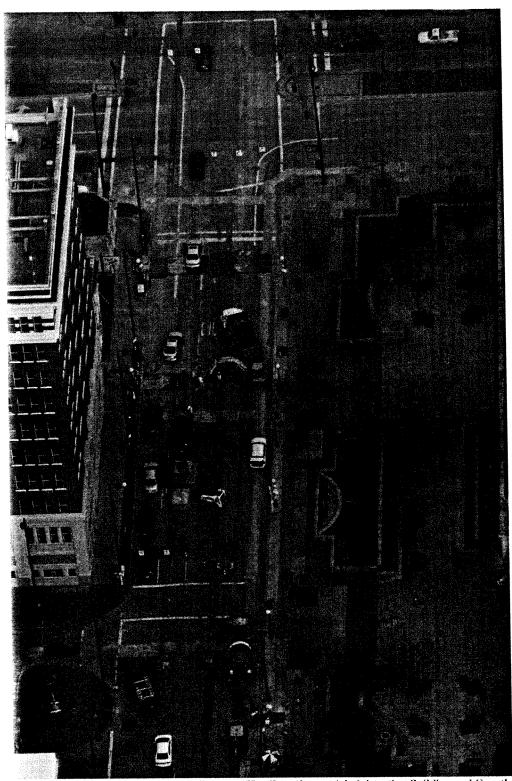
Watermain tie-ins on Main St adjacent to Hamilton County Administration Building and Courthouse
